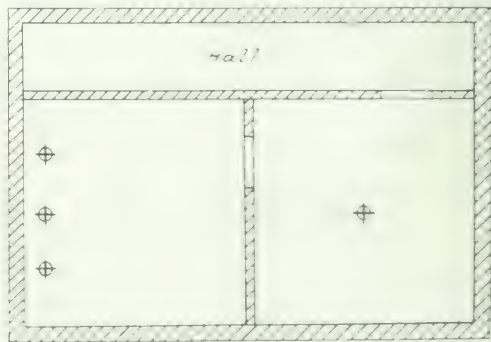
PLAN OF BASEMENT UNDER OFFICE ROOM.
